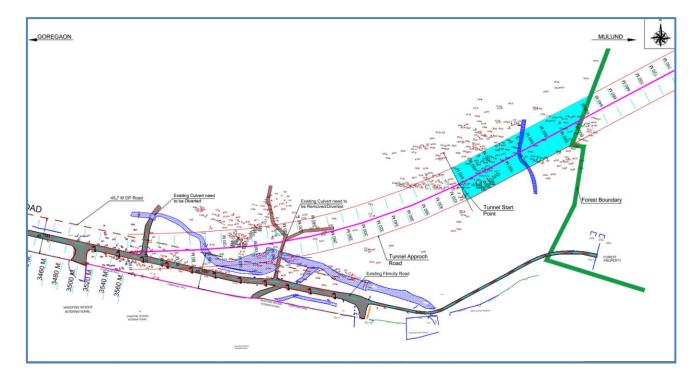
Drain and Culvert on Film city side Tunnel west side approach road
